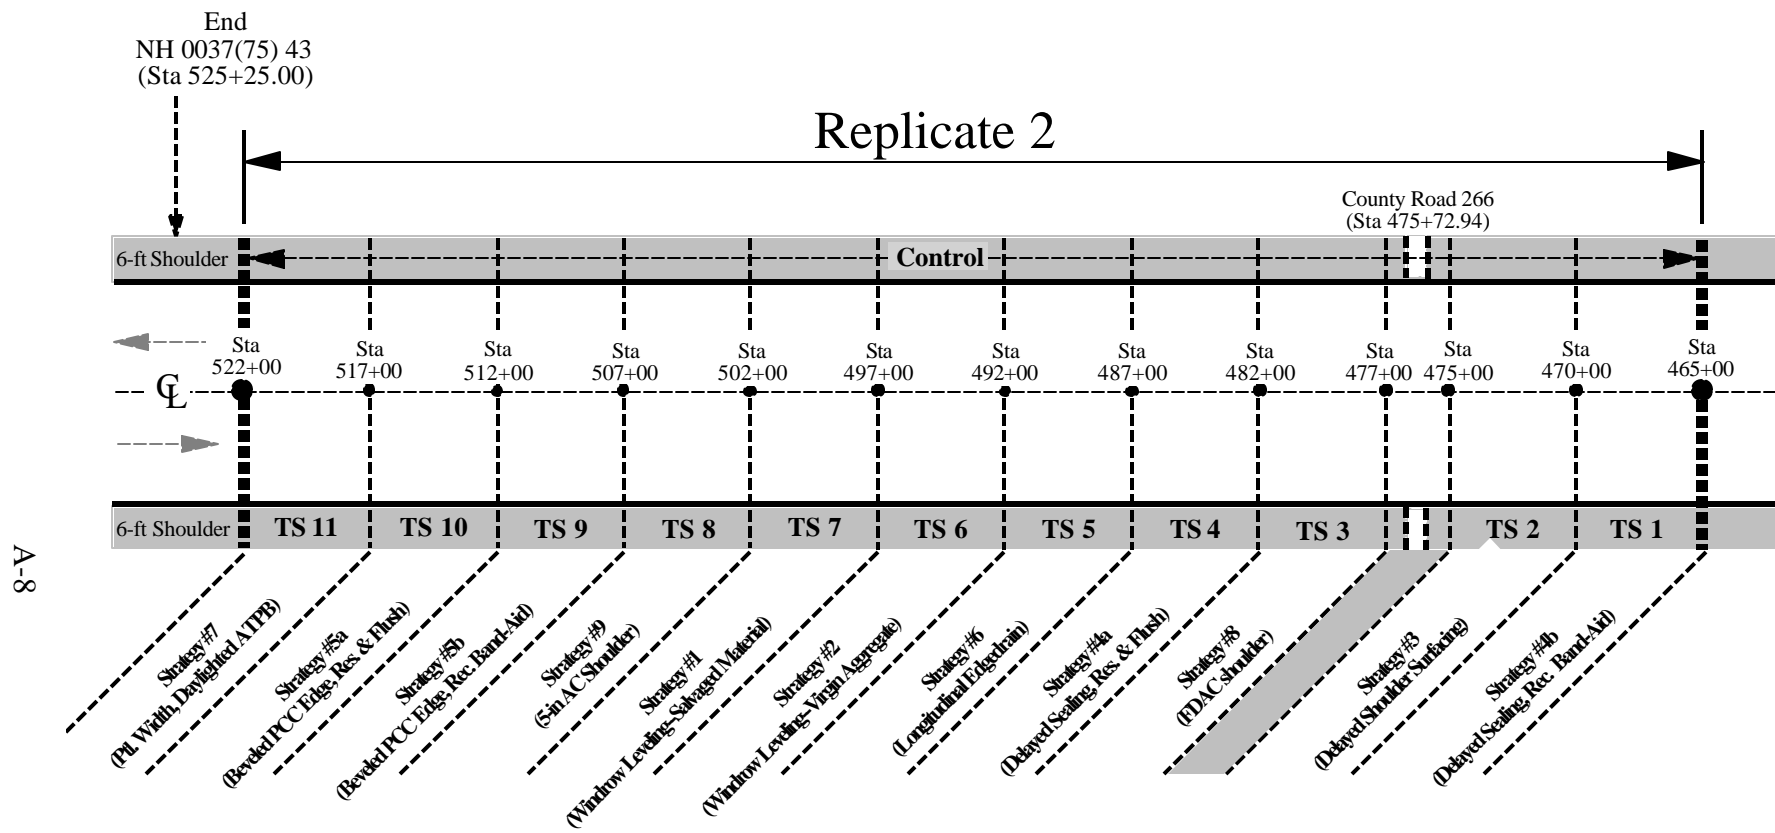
Shoulder test site layout for State Route 37 construction project (continued).
